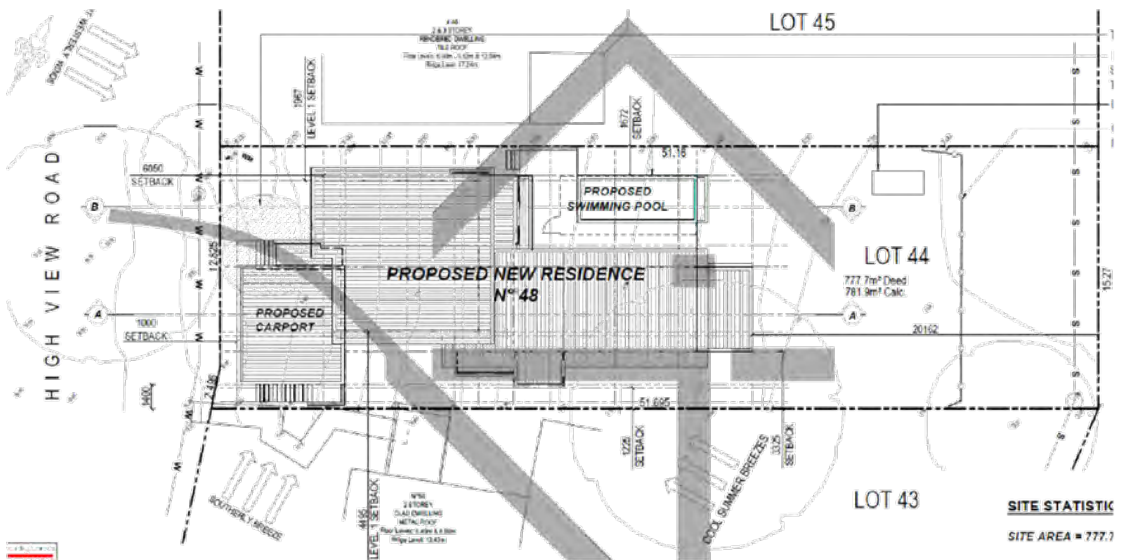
Site Plan No. 48 High View Road Pretty Beach
